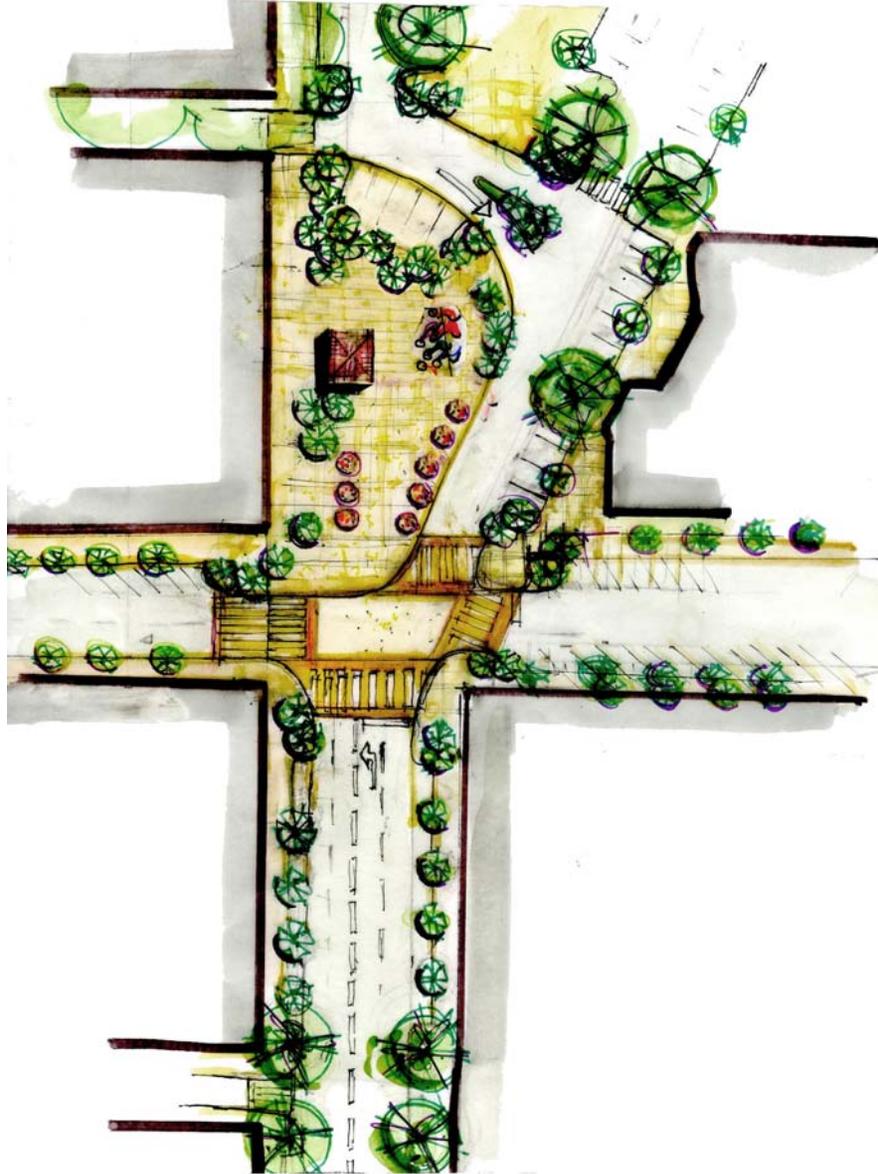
Concept for Tybrisa Street Gateway and Seven Flags Park
